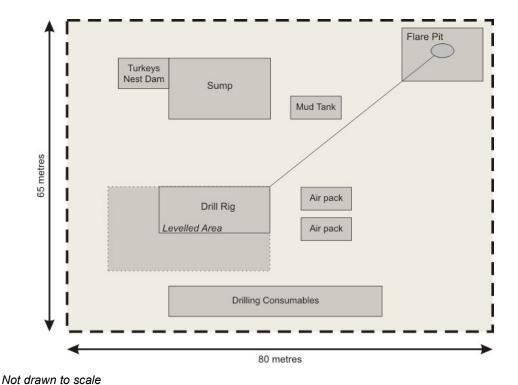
Schematic of Typical Appraisal Drilling Lease Layout
